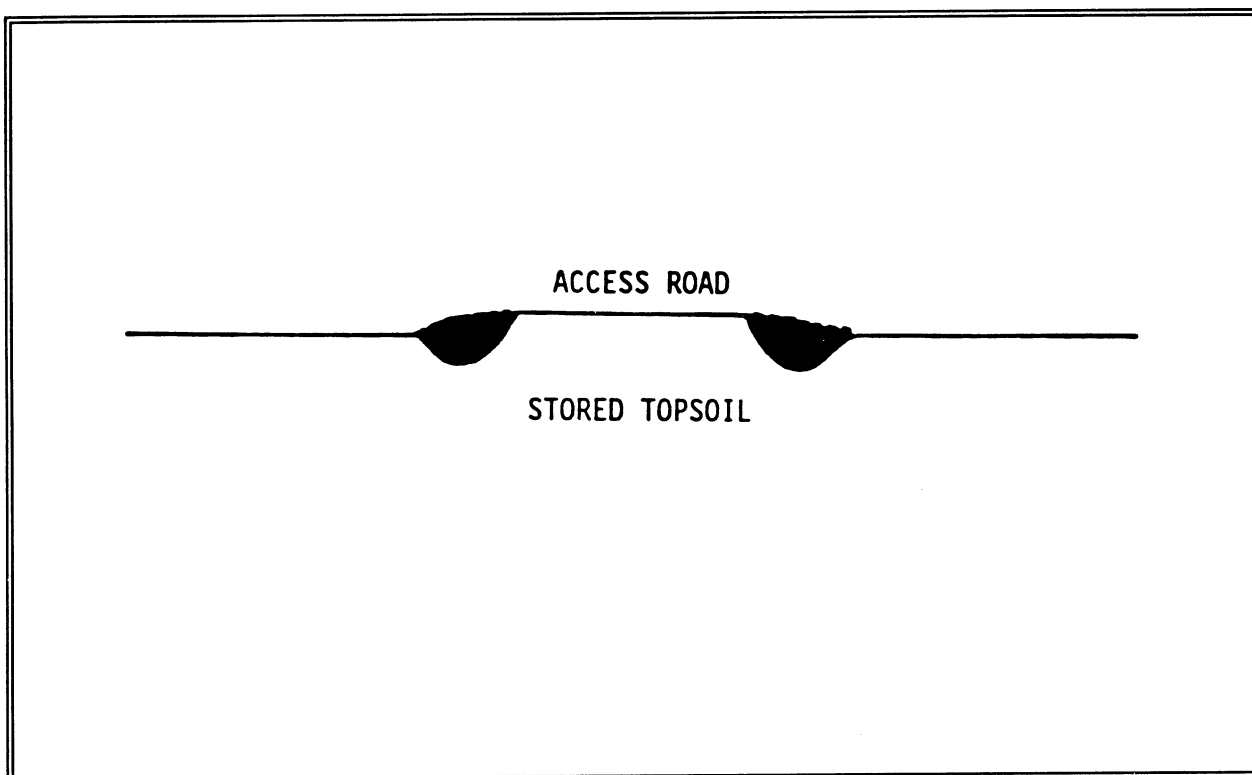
Topsoil Stripped from Access Road, Stored in Ditches.
